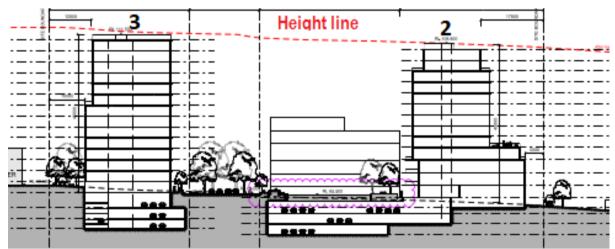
Section through north south illustrating Buildings 2 & 3 height limit.
